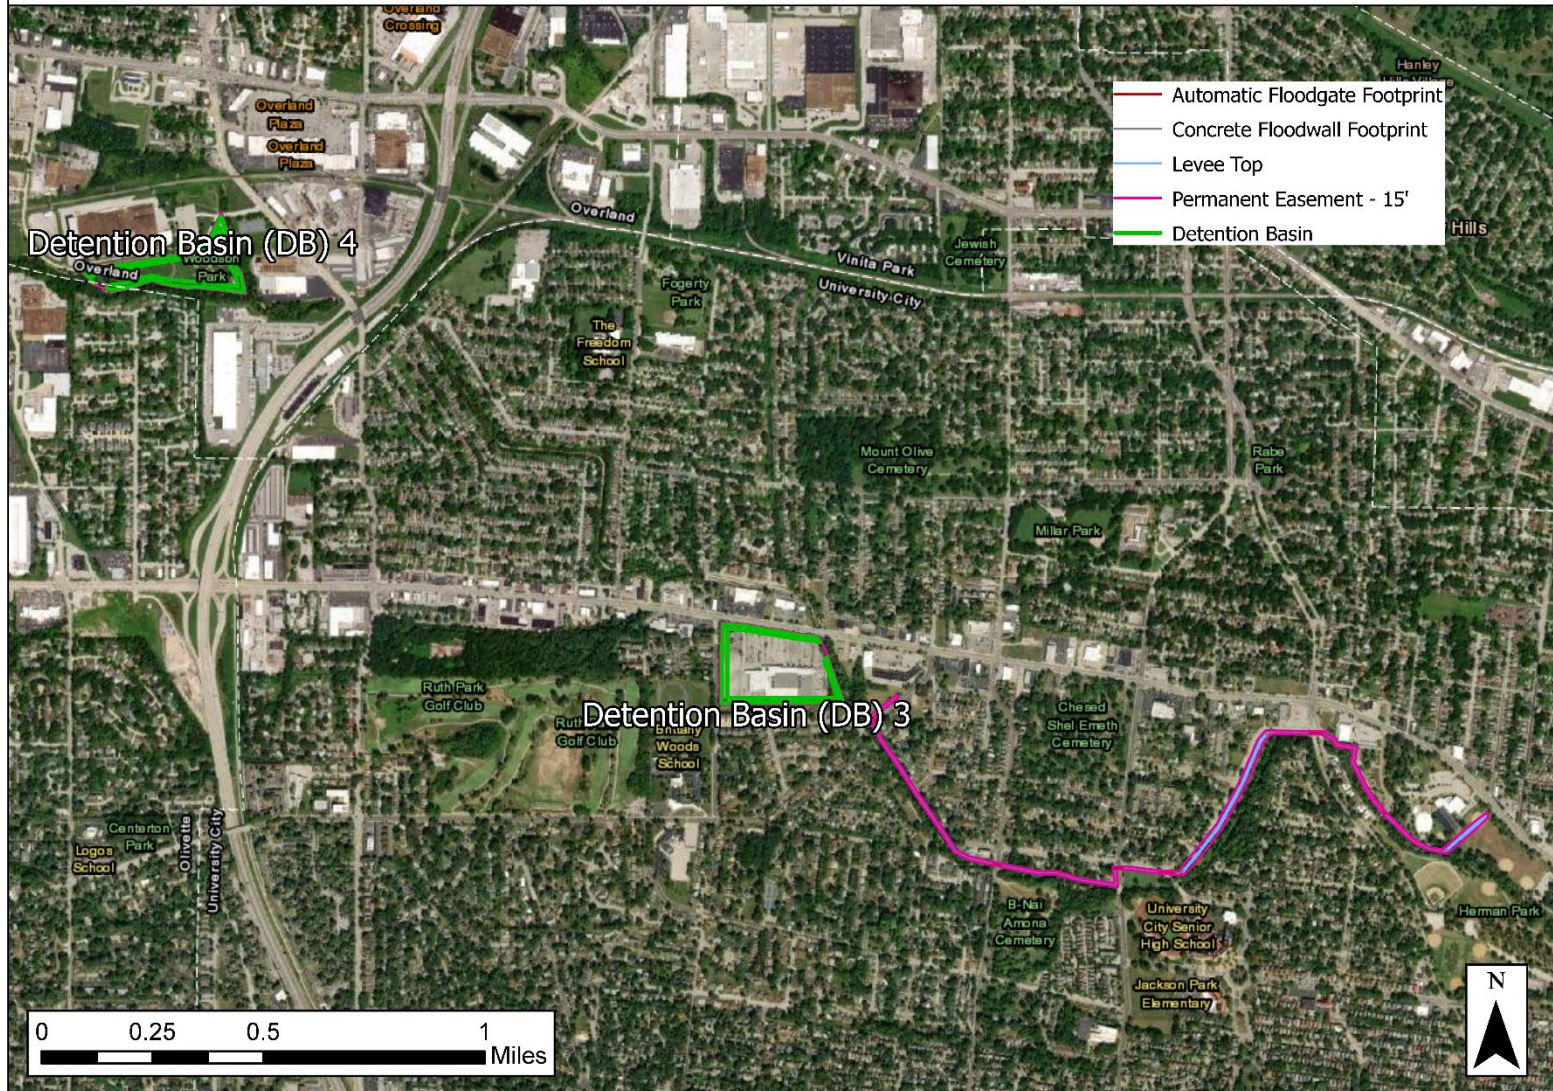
Alternative 4 – Levee/Floodwall with DB3 and DB4.
